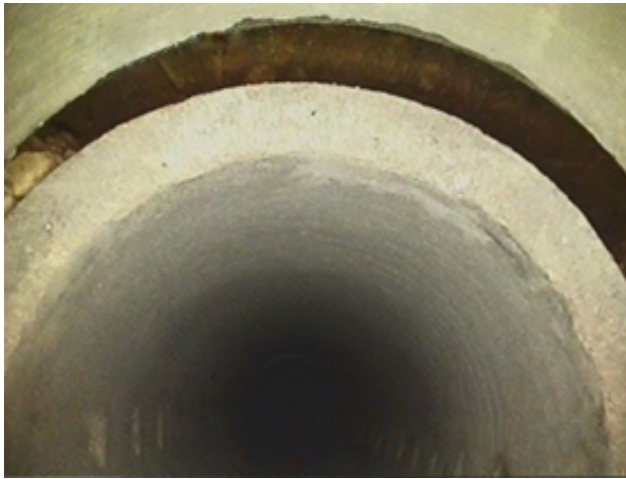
View of a large joint opening through which overlying material had fallen, creating a void.
